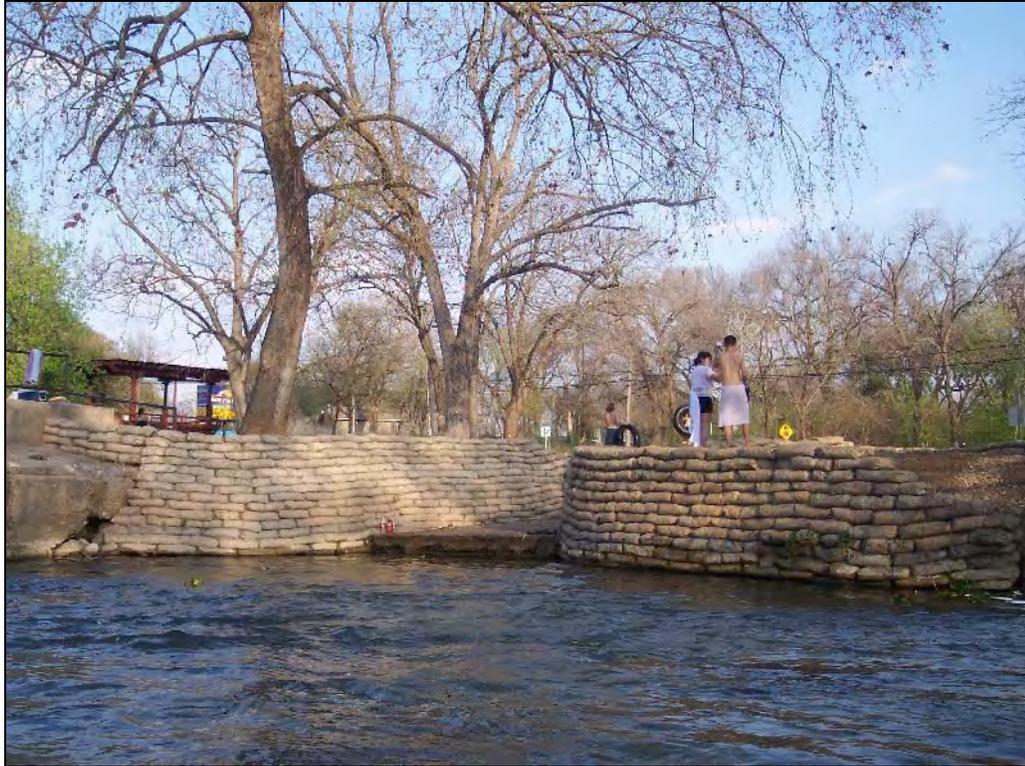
Site 11: Sandbag Retention Wall, March 2006. Source: author.
